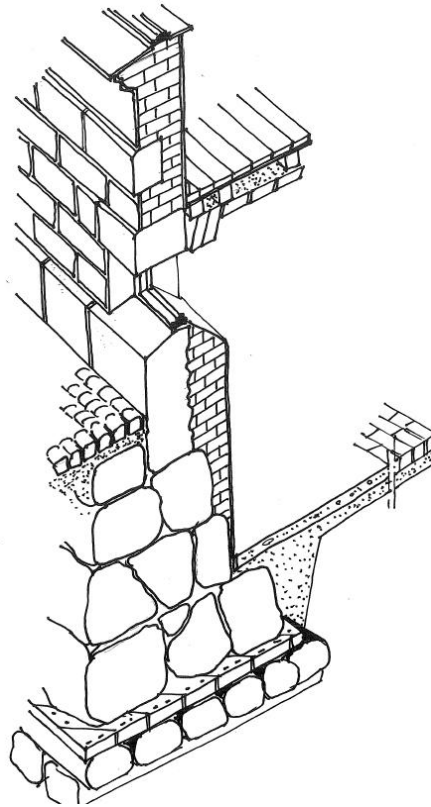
Foundations and foundation wall used in blocks and flats (1900)
